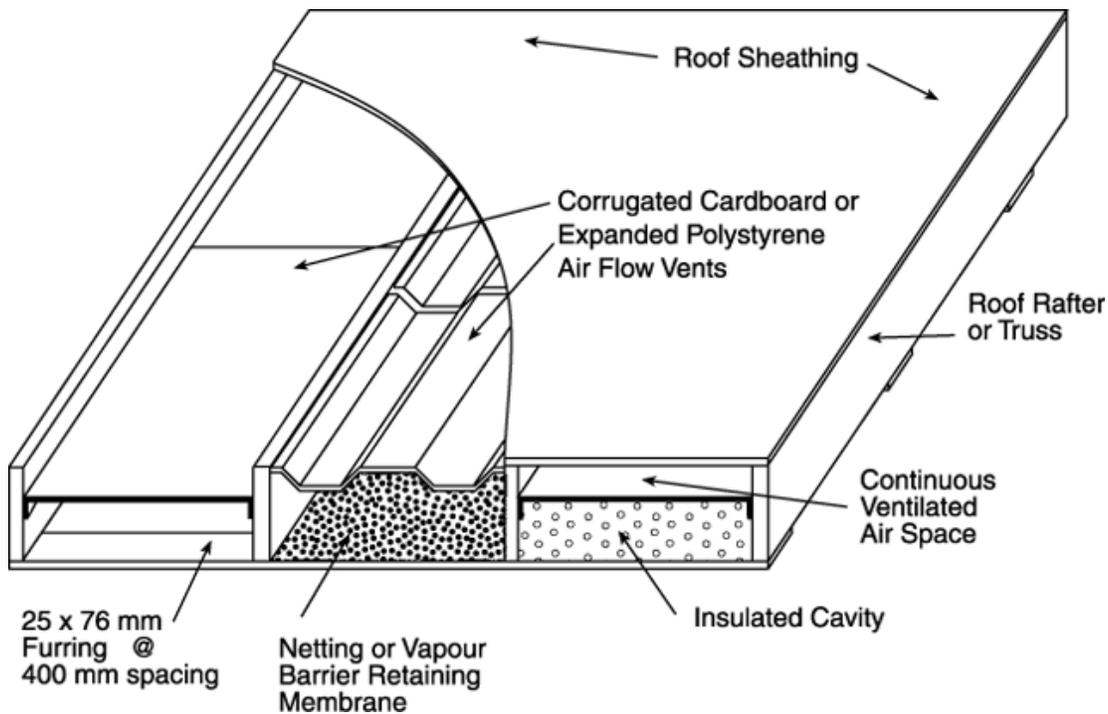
Section of a typical sloped ceiling assembly – 600 mm centre construction
